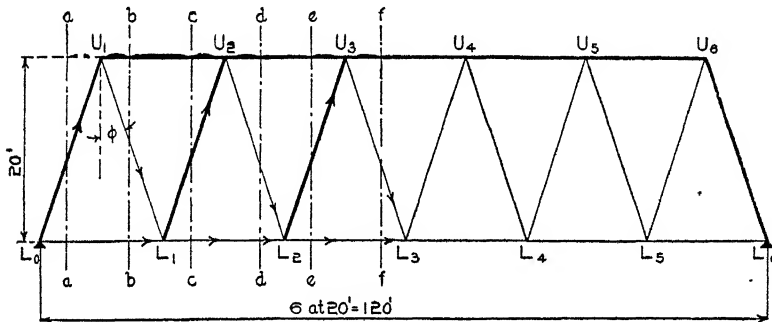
Calculation of Stresses in a Six-Panel Warren Truss Through Bridge.
